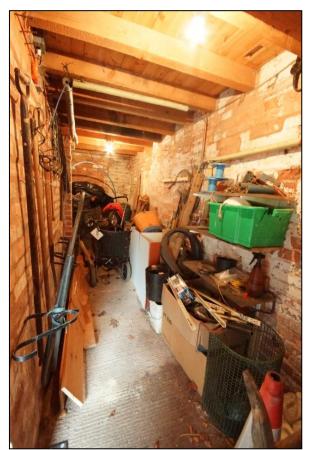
The ground floor (west room) of Building 06, viewed looking south-west.
